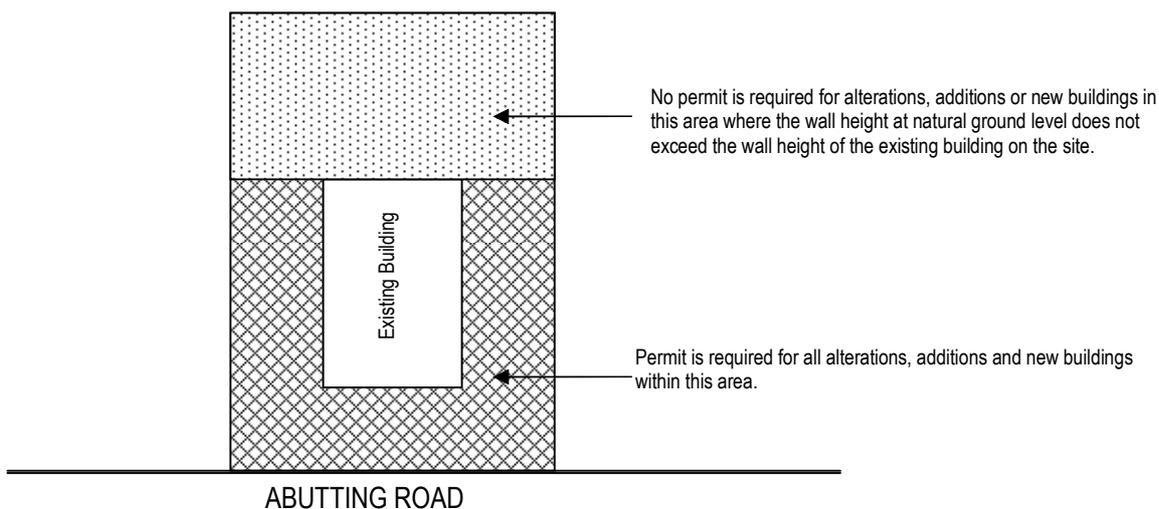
Exemptions for alterations, additions and new buildings for non-contributory places not on a corner site within the Heritage Overlay.
